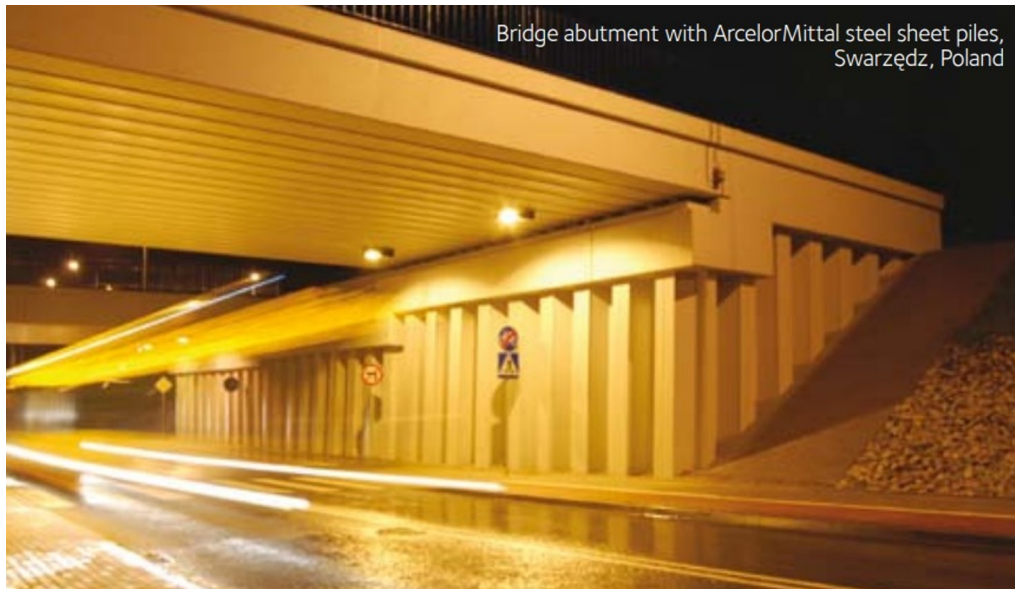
Overpass with steel sheet pile wall foundations in Poland.
